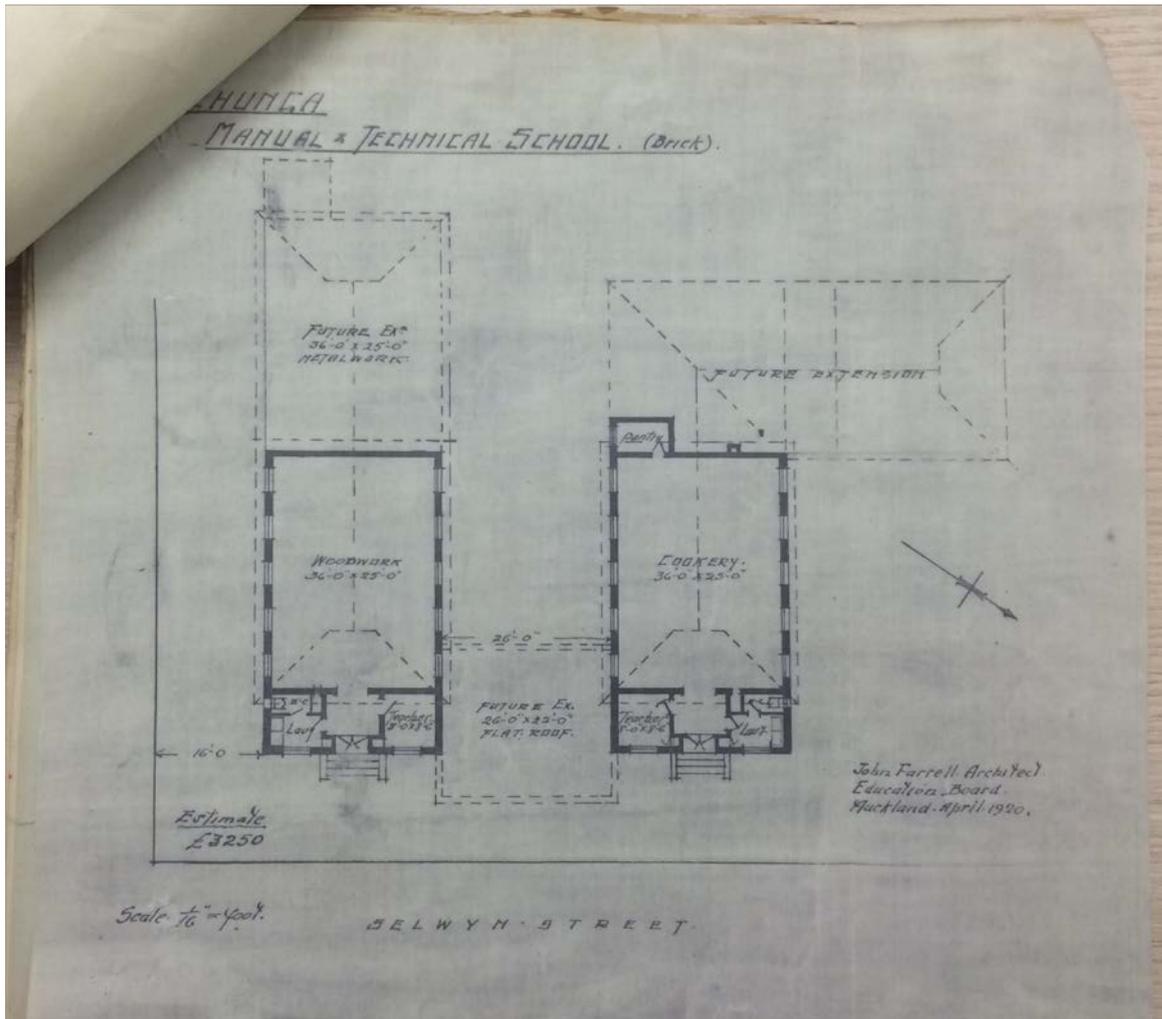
Final drawing by John Farrell in 1920. Shows a plan of the building and possible future extensions. The future extensions were never built. (Education Department. (1919-1981) Buildings and Sites - Onehunga Manual Training Centre (R22887276) at Archives New Zealand)
